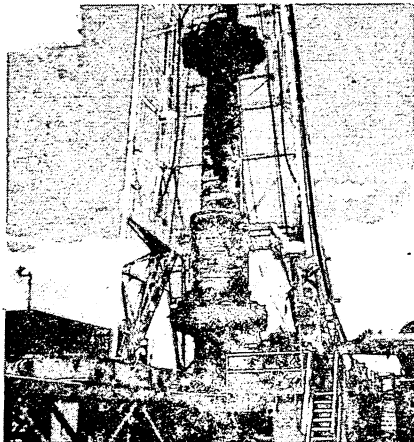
Drill Rig and Bit for WIPP Shaft Drilling.
